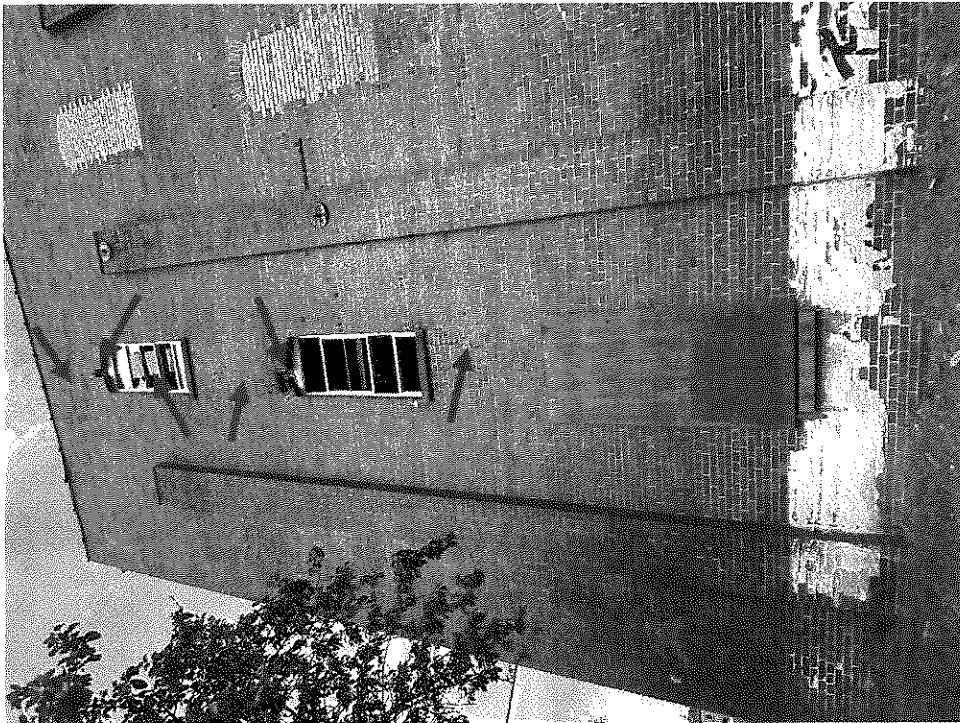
East side of the southeast corner of the building. Bricks have fallen out of the tops of the arch top windows and crack in the brick wall extends down to the ground. Blue in top window is collapsed roof.
